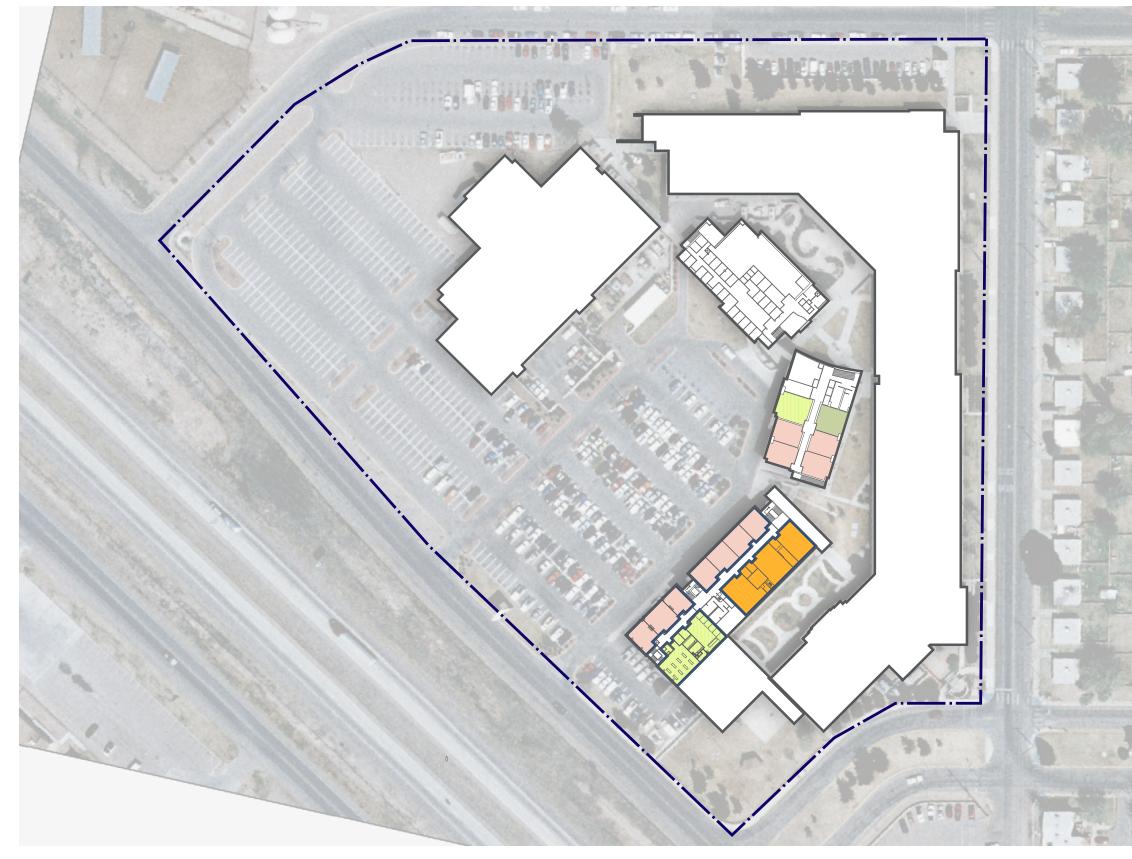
Instructional Use (Second Floor), Central Campus at NMSU
